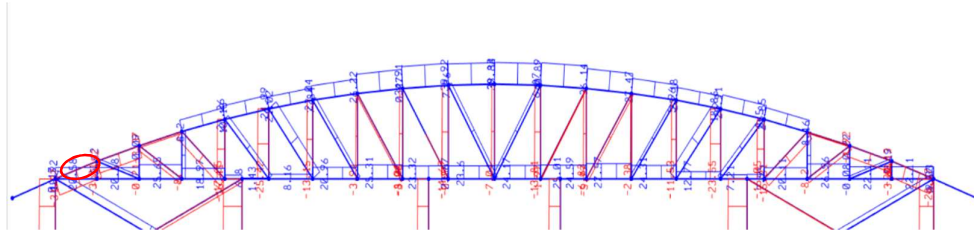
Element in compression to be designed on the reticular steel roof.
